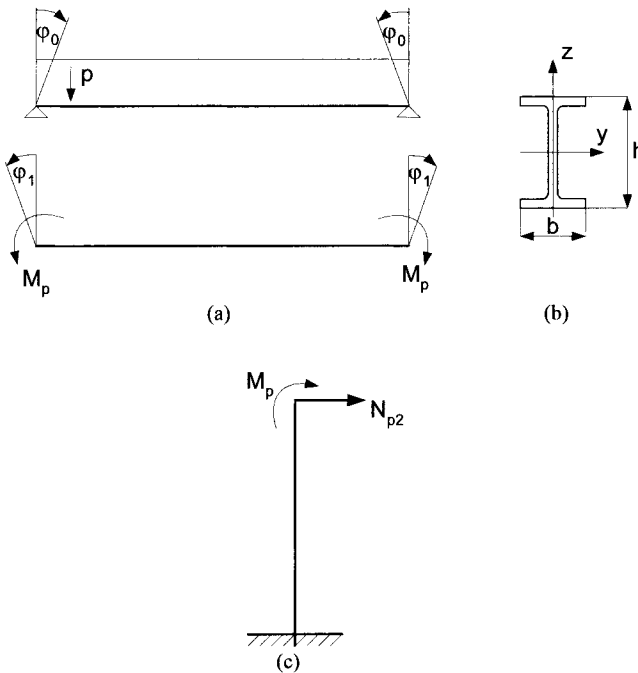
(a) Angle deformations of the beam due to uniform normal load. (b) The main dimensions of a rolled I-beam. (c) Bending moment and horizontal force acting on a column
